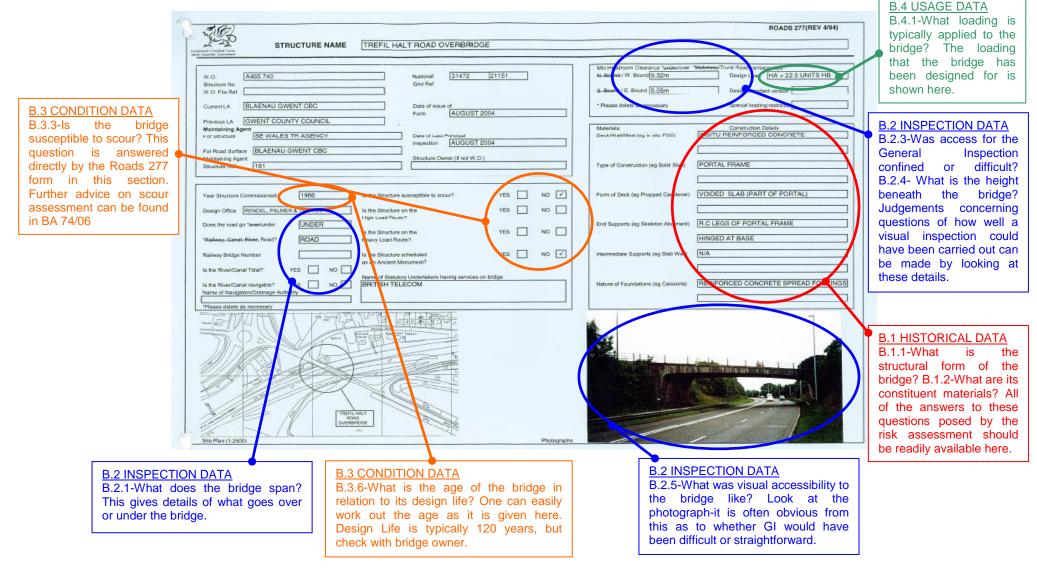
Using the Roads 277 to risk assess single-span bridges (Page 1 of 2)
